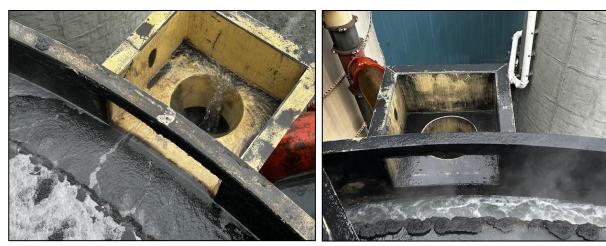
Completed corrective action of cutting-away the tank wall to allow overflow to enter the secondary overflow collection pipe from both tanks.
